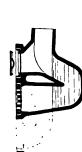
Doulton's stoneware gully traps with means of access to drain.
